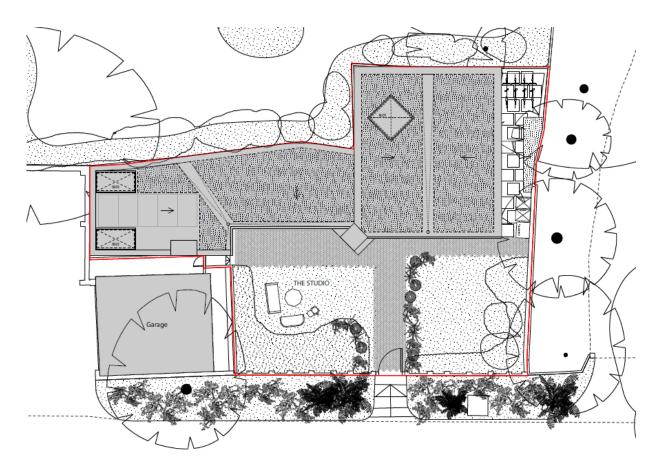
Extract of proposed layout plan (ref: 207_GA_102_A).
